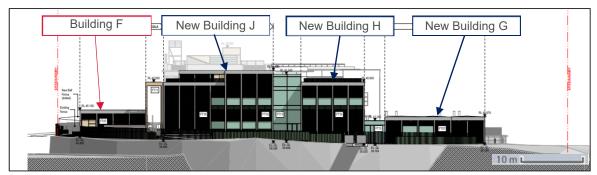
| Southern elevation (Source: Applicant's RtS 2020)
